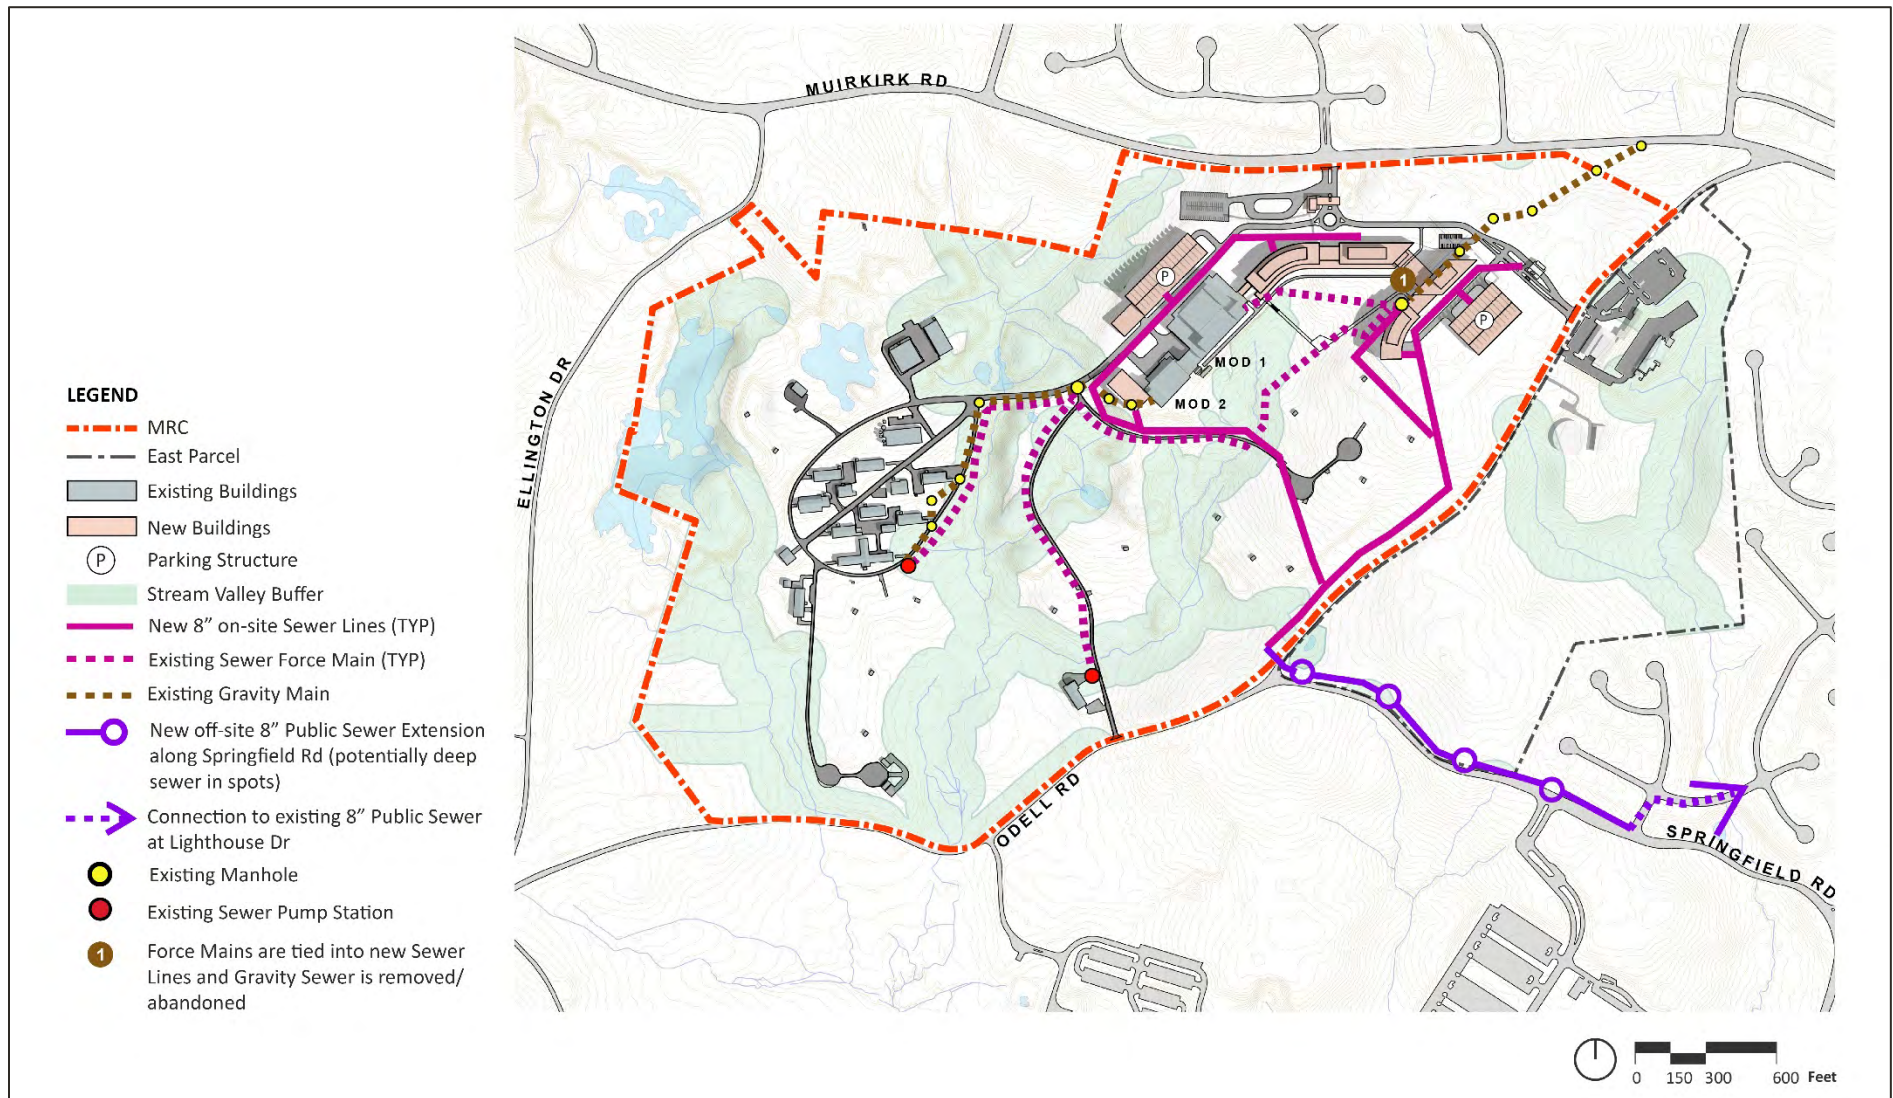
Proposed Sewer Service Plan for Alternative B
